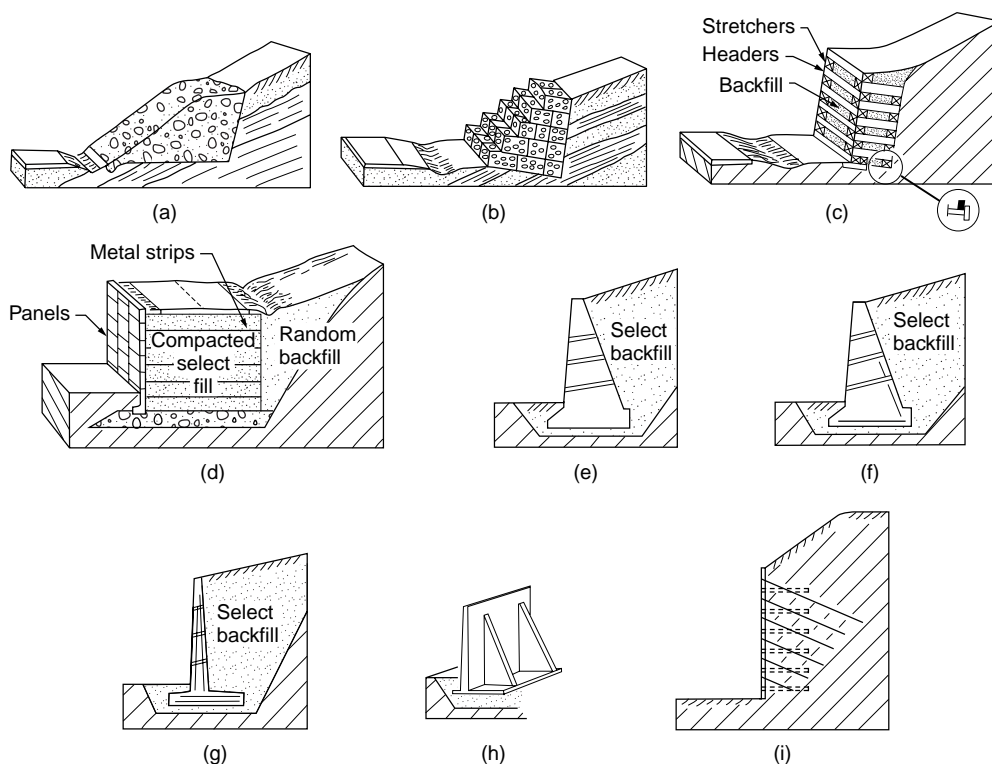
Various types of retaining walls: (a) rock-filled buttress; (b) gabion wall; (c) crib wall; (d) reinforced earth wall; (e) concrete gravity wall; (f) concrete-reinforced semigravity wall; (g) cantilever wall; (h) counterfort wall; (i) anchored curtain wall. (Source: Hunt, R. E. 1986. *Geotechnical Engineering Techniques and Practices*. McGraw-Hill, New York. Reprinted with permission of McGraw-Hill Book Co.)
